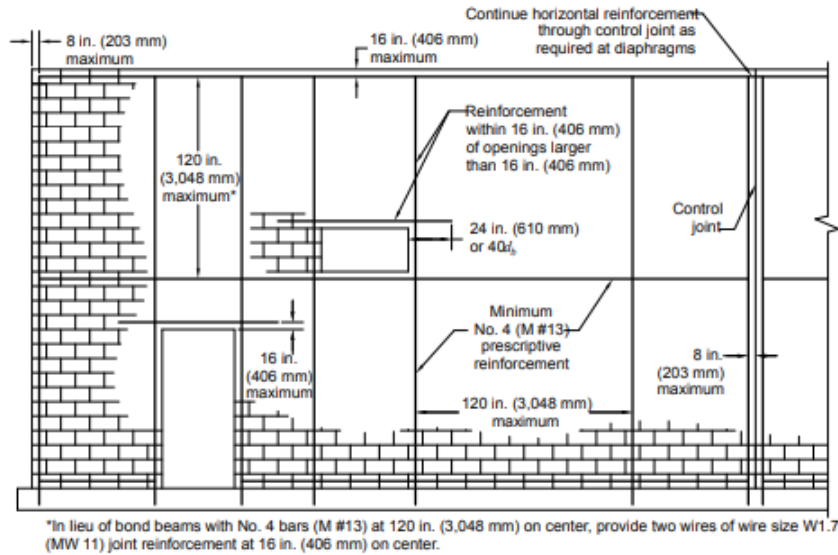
Prescriptive Seismic Detailing for Detailed Plain (Unreinforced) Masonry Shear Walls and for Ordinary Reinforced Masonry Shear Walls
